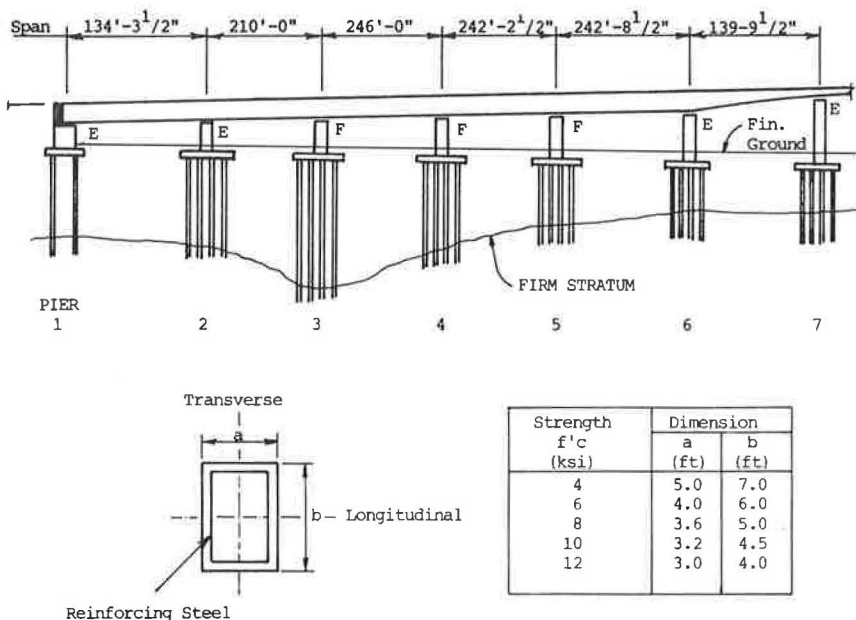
Top: Elevation of bridge used in seismic analysis. Bottom: Pier cross-section dimensions and concrete compressive strength used in seismic analysis.
